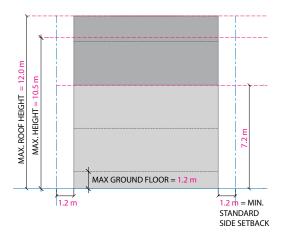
FRONT ELEVATION WITH TRANSITION
